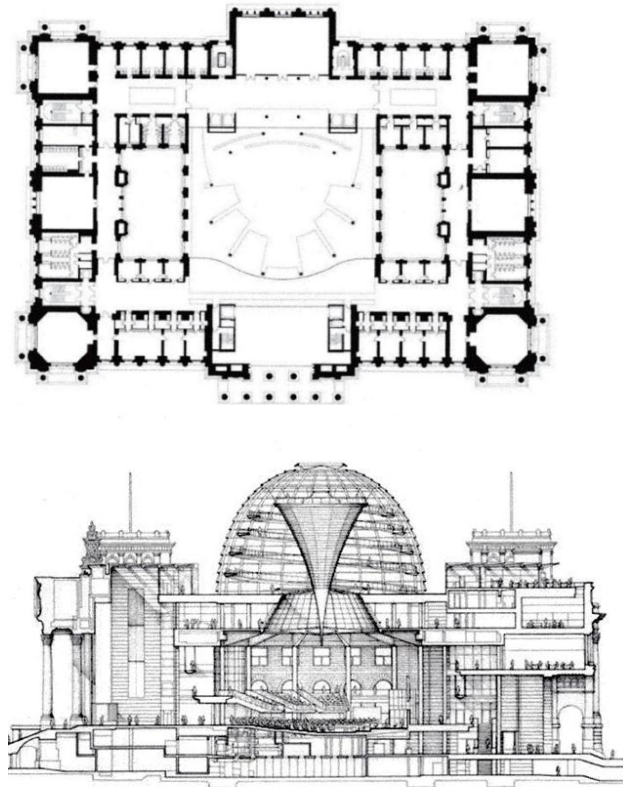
The renewed plan and transparent roof attachment of Berlin Parliament building [URL-4]
